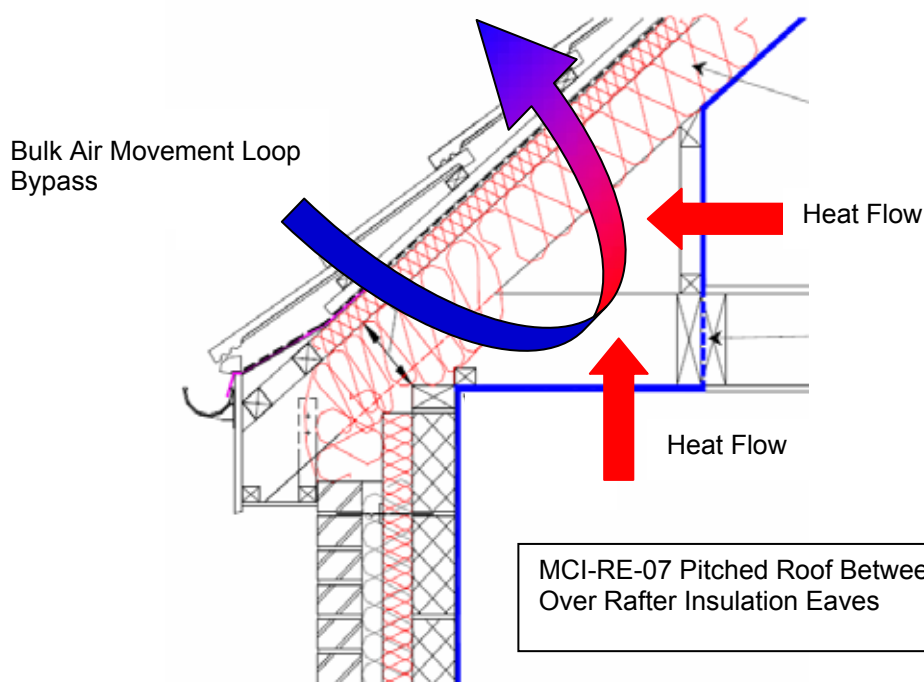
Loop Thermal Bypass - Accredited Detail MCI-RE-07: Pitched Roof Between Over Rafter Insulation at Eaves
